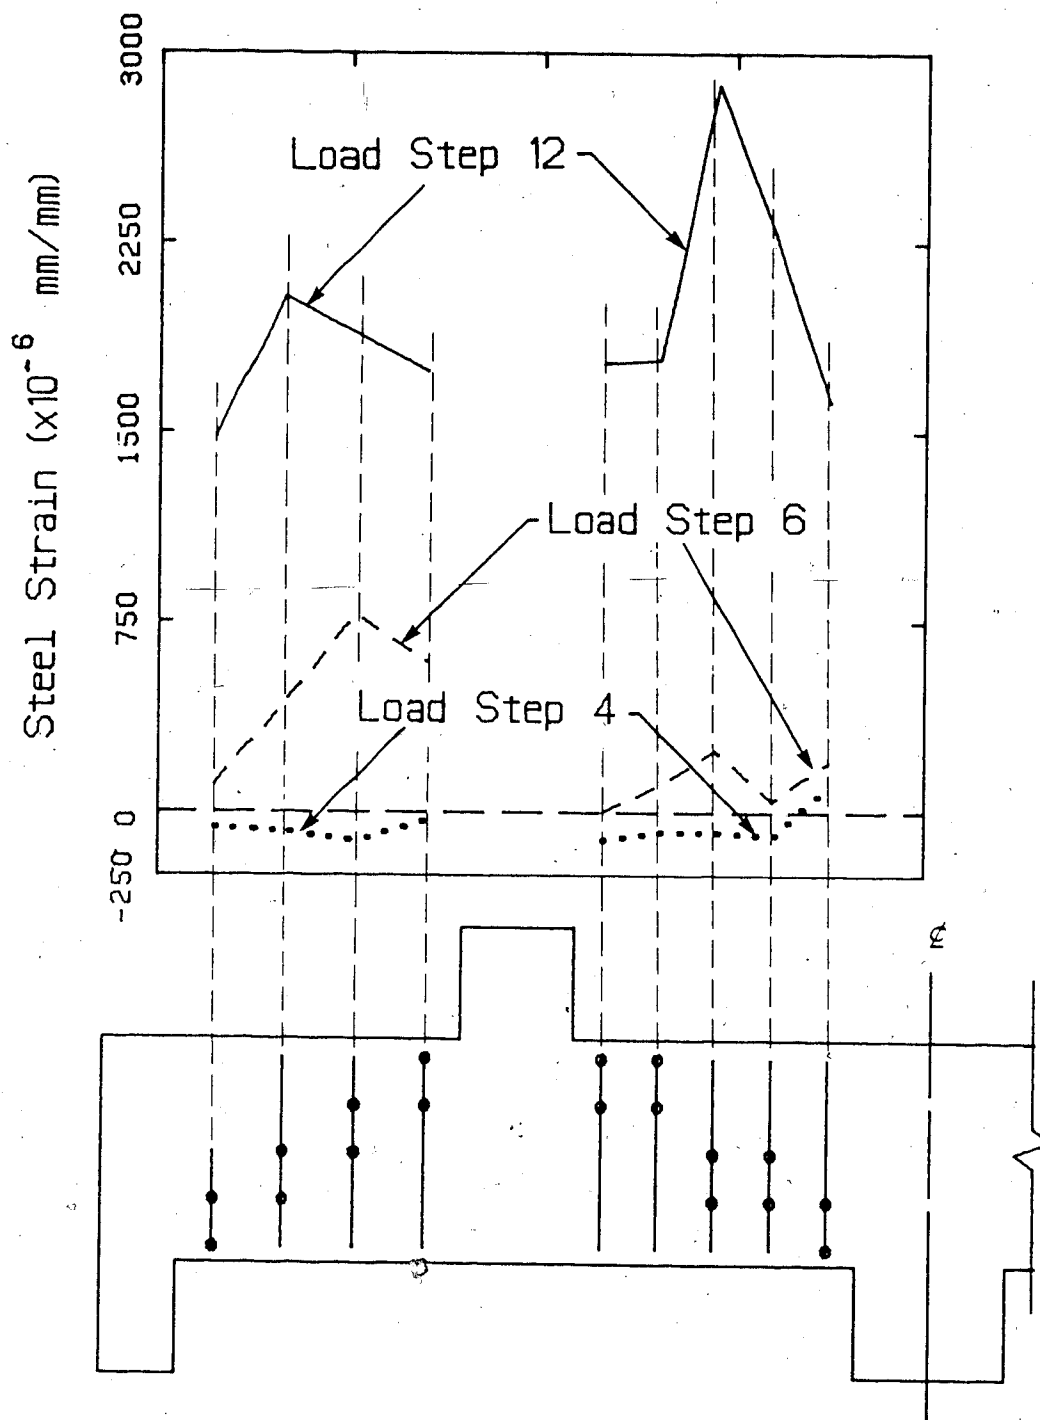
Steel Strain Distribution of Vertical Stirrups Crossing Major Inclined Cracks in Beam No. 2
